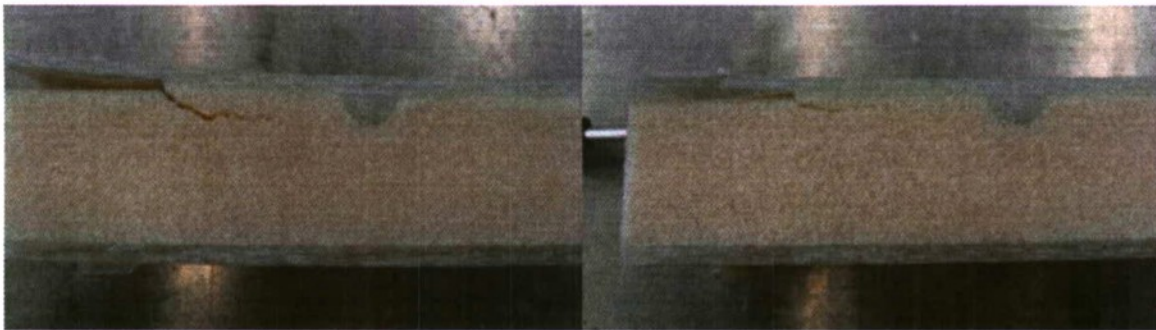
Monotonic shear key failure cracks in foam (1.0 inch shear key)
